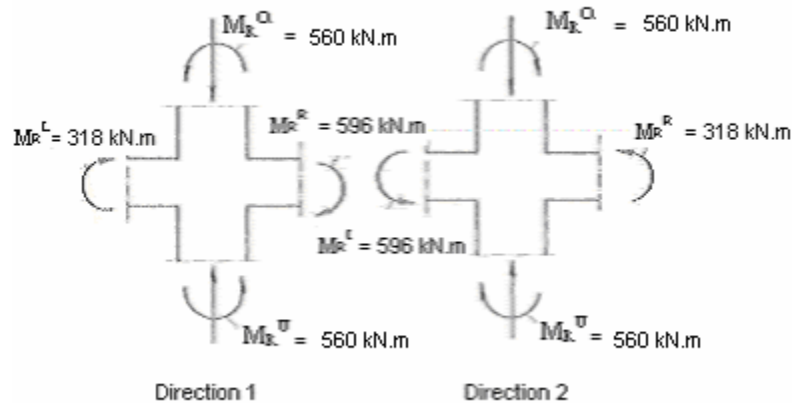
Strong column weak beam connection at the interior connection N6 and N7
